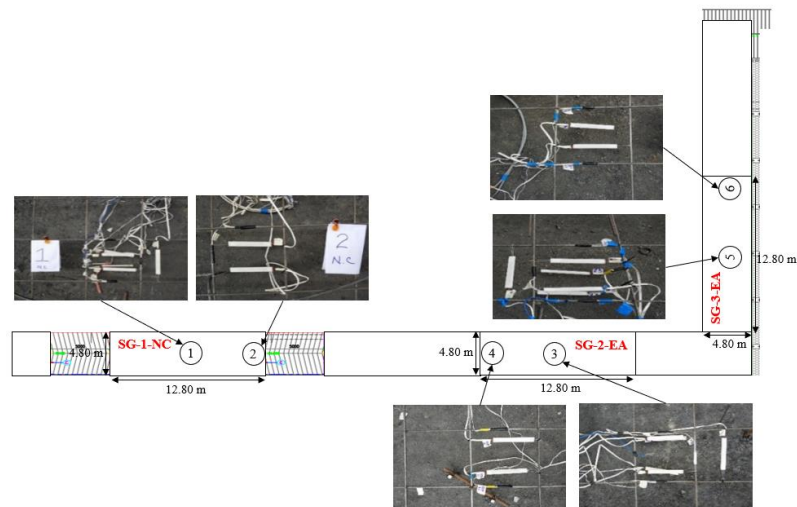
Measurement locations for slabs on grade at construction site 1
